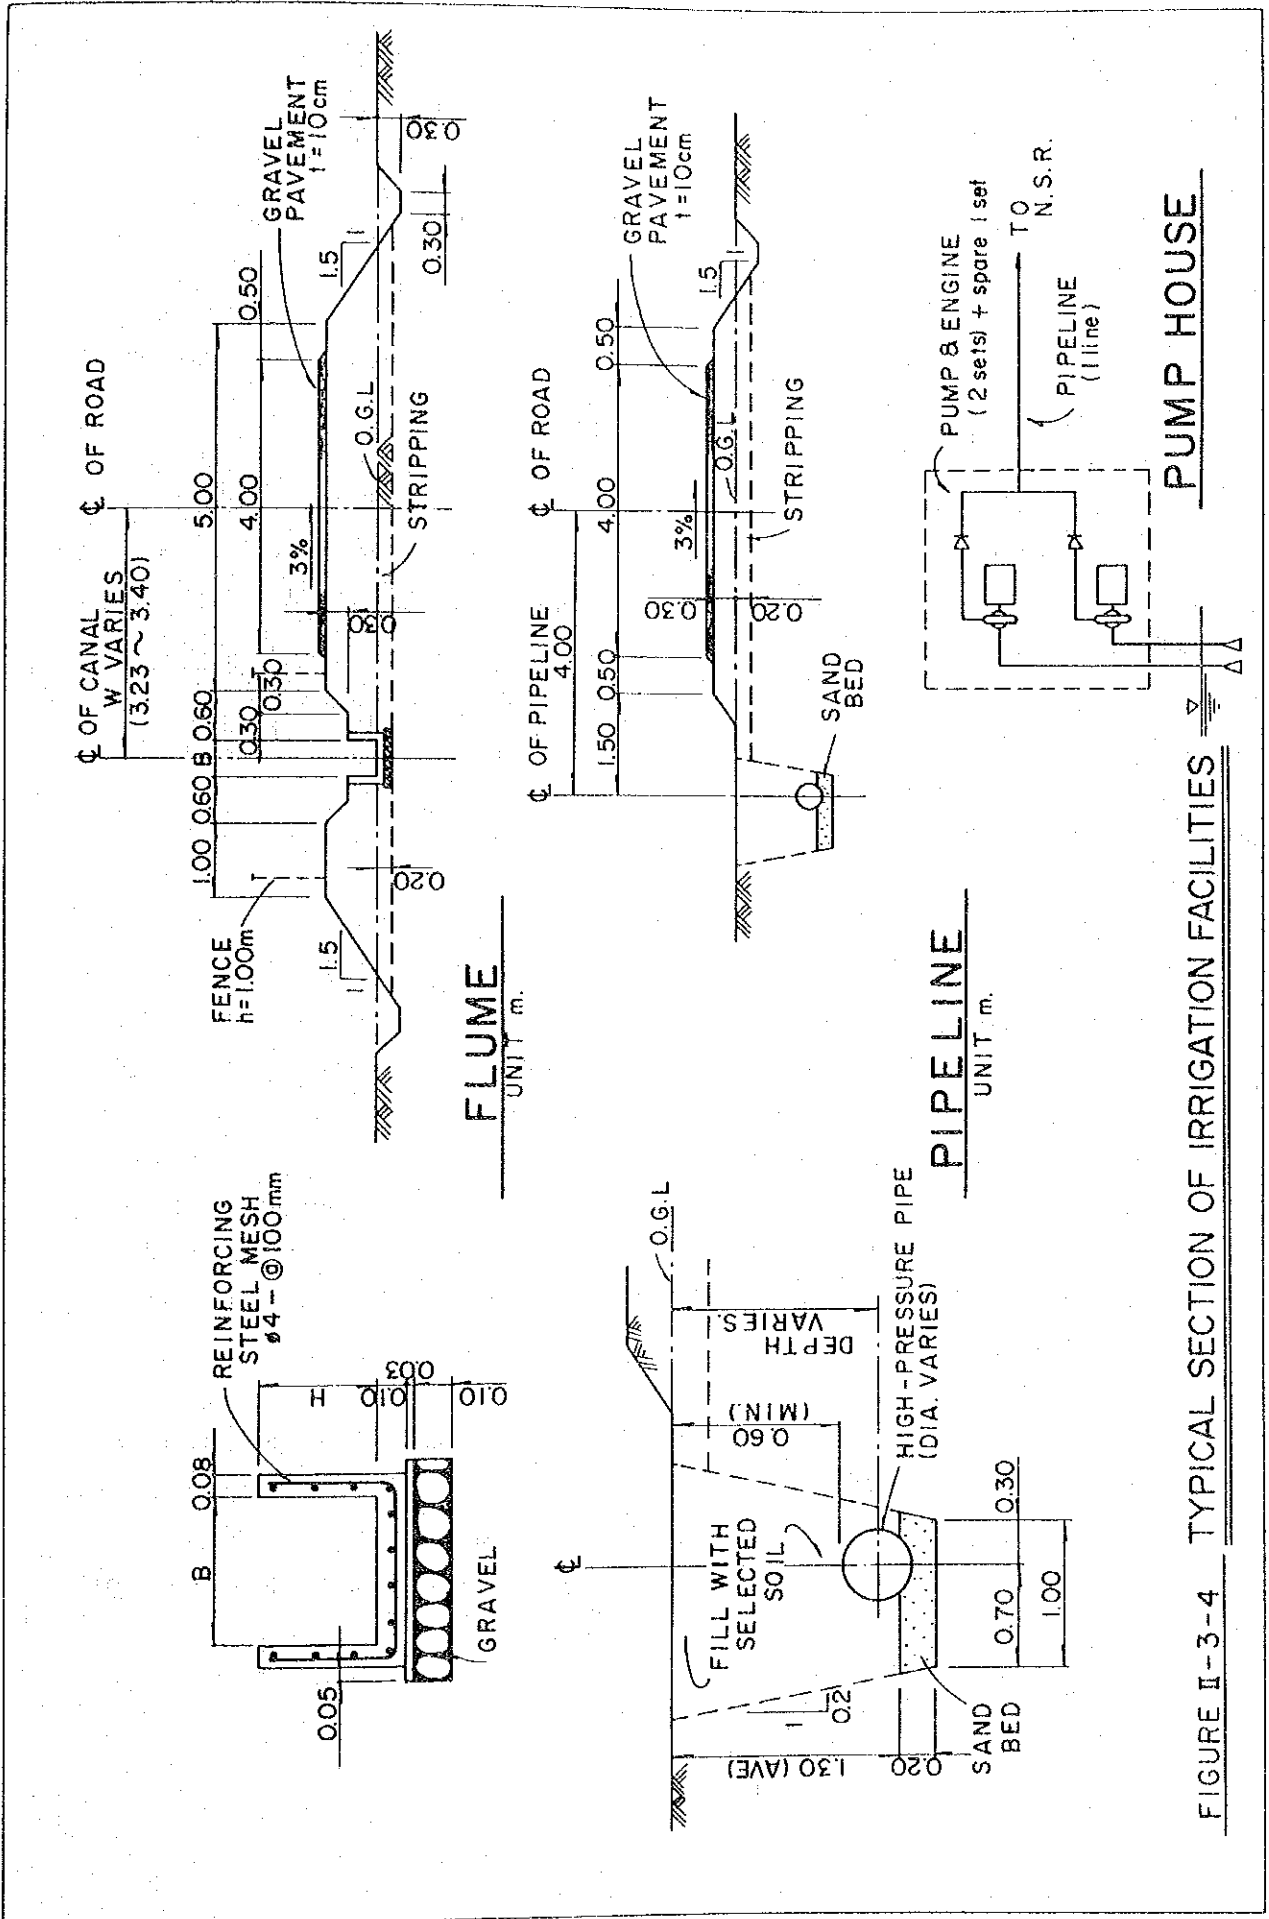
TYPICAL SECTION OF IRRIGATION FACILITIES
